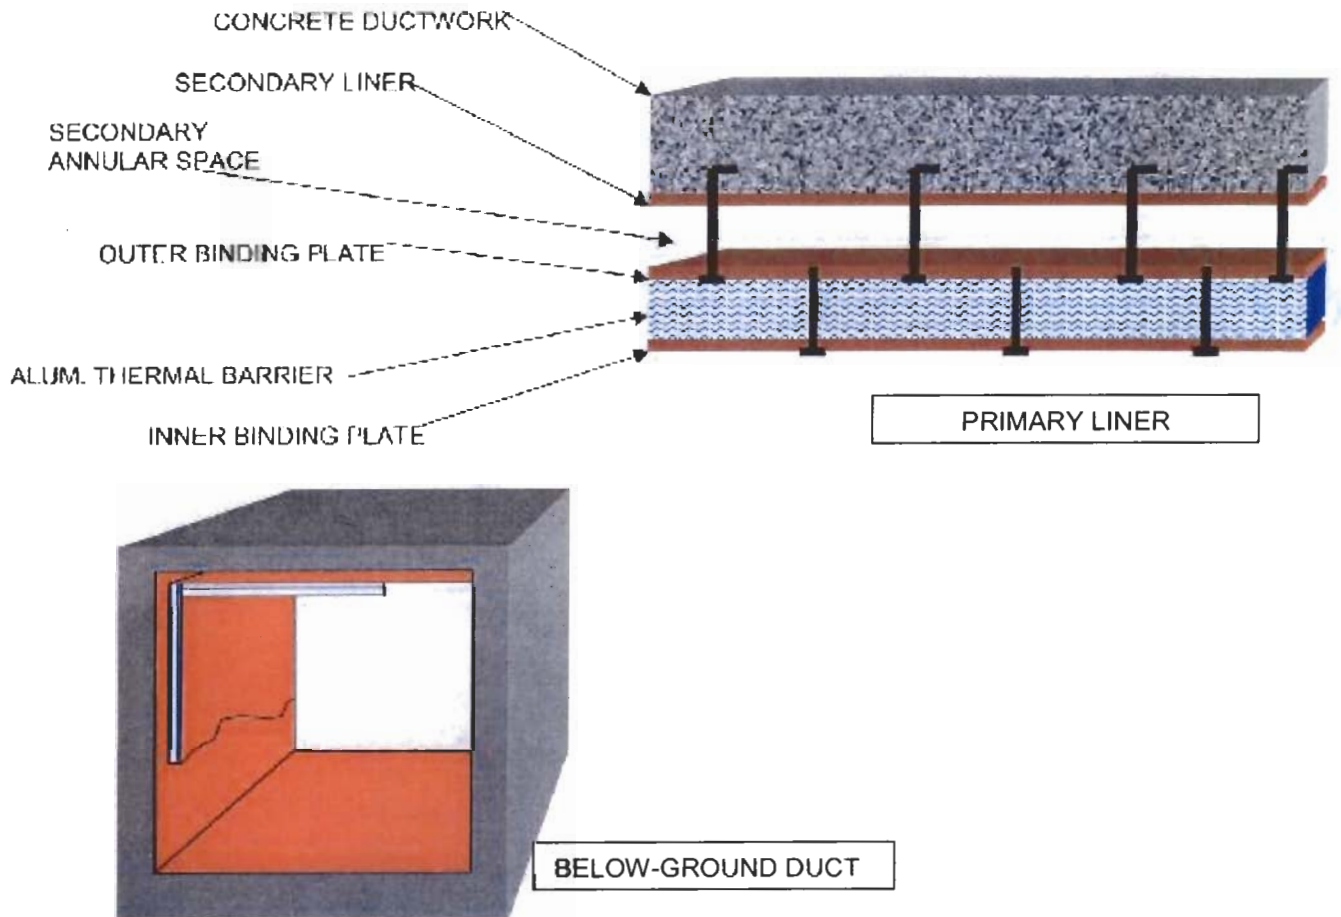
Below-Ground Duct and Primary Liner Construction Cross-Section
